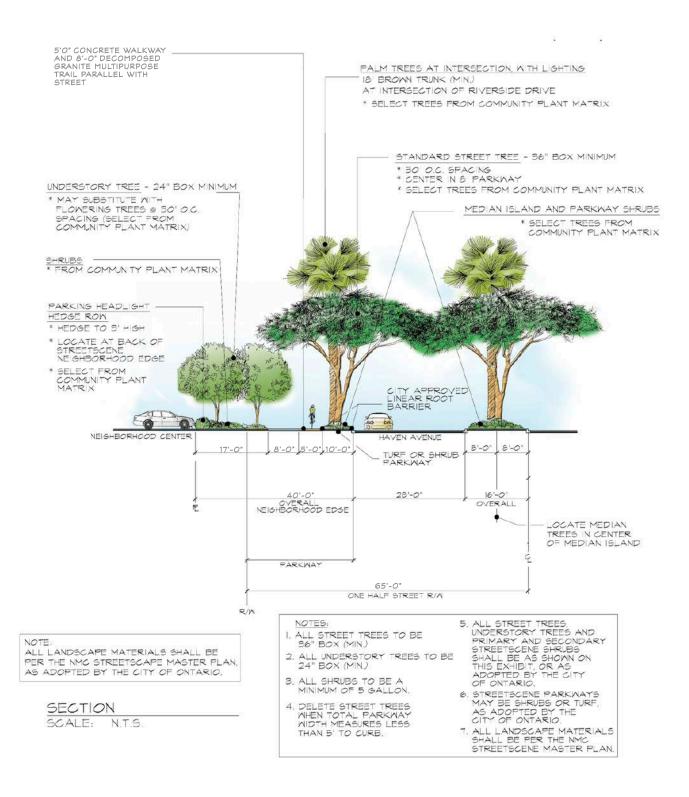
Haven Avenue Streetscene At Neighborhood Center Commercial
